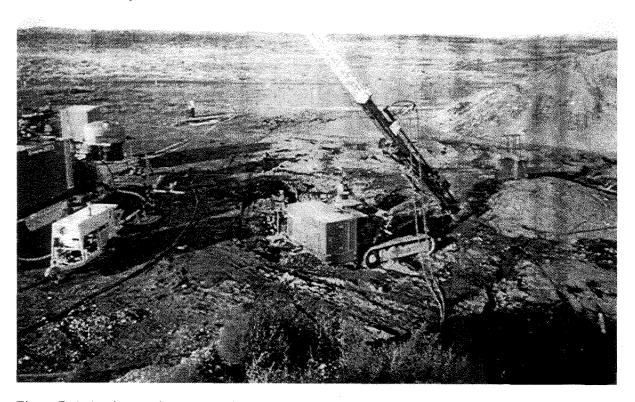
Angle grouting at Brookhaven National Laboratory (Dwyer et al. 1999).
